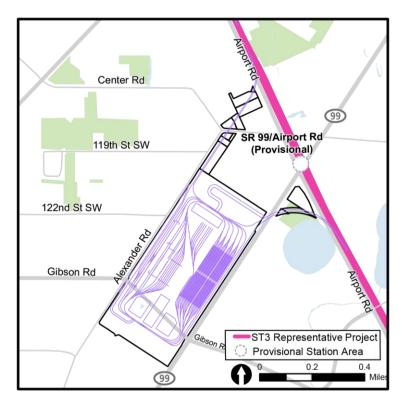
OMF Site: SR 99 and Gibson Rd (Site F) Conceptual Layout
